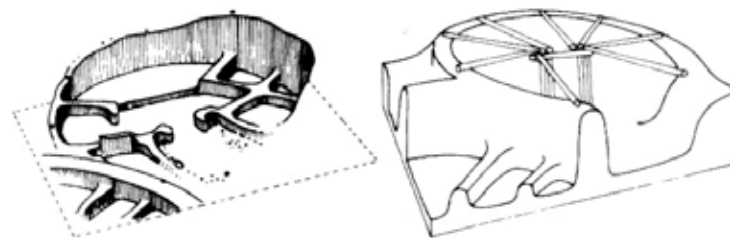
First use of inclined roofs in Mureybet site (CAUVIN 1984).
